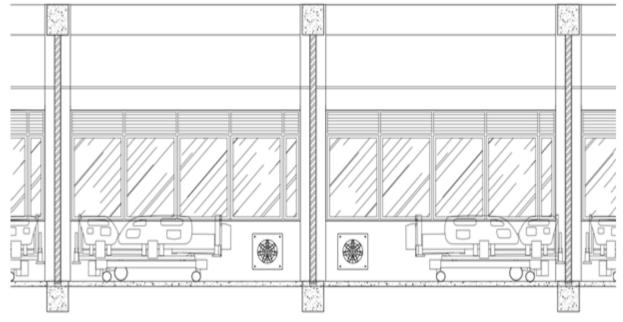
Section 1, view of ventilation, openings, and exhaust fan which is placed facing the yard
